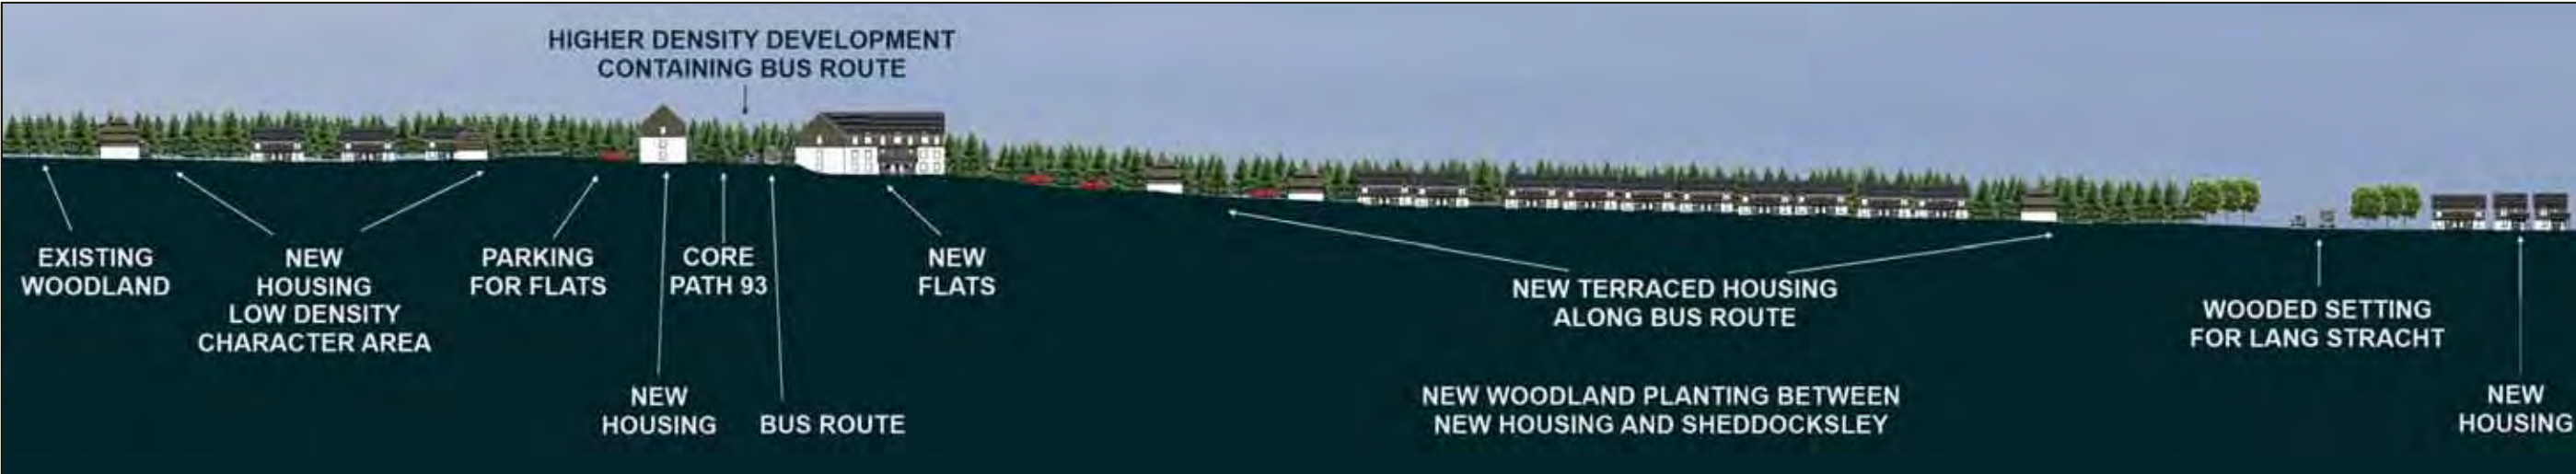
section 2 - through the eastern area of Area A, between Whitemyers House and Sheddocksley.
